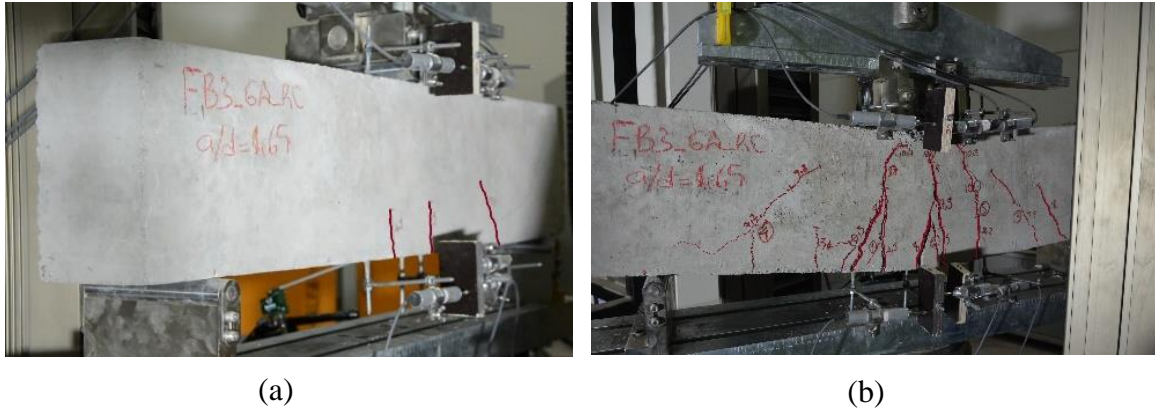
CVC – RA – 1.65 beam, (a) first cracks, (b) failure
